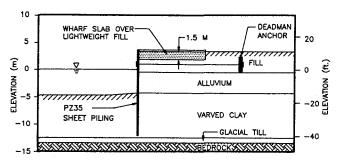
Lightweight fill placed to improve stability for wharf's sheet pile bulkhead.
